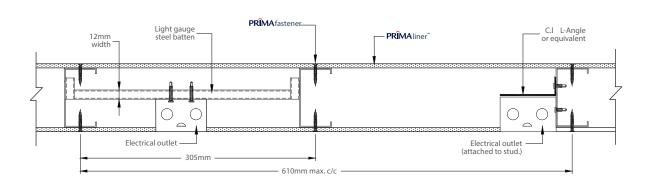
Electrical outlet in between section C-C and electrical outlet attached to stud
